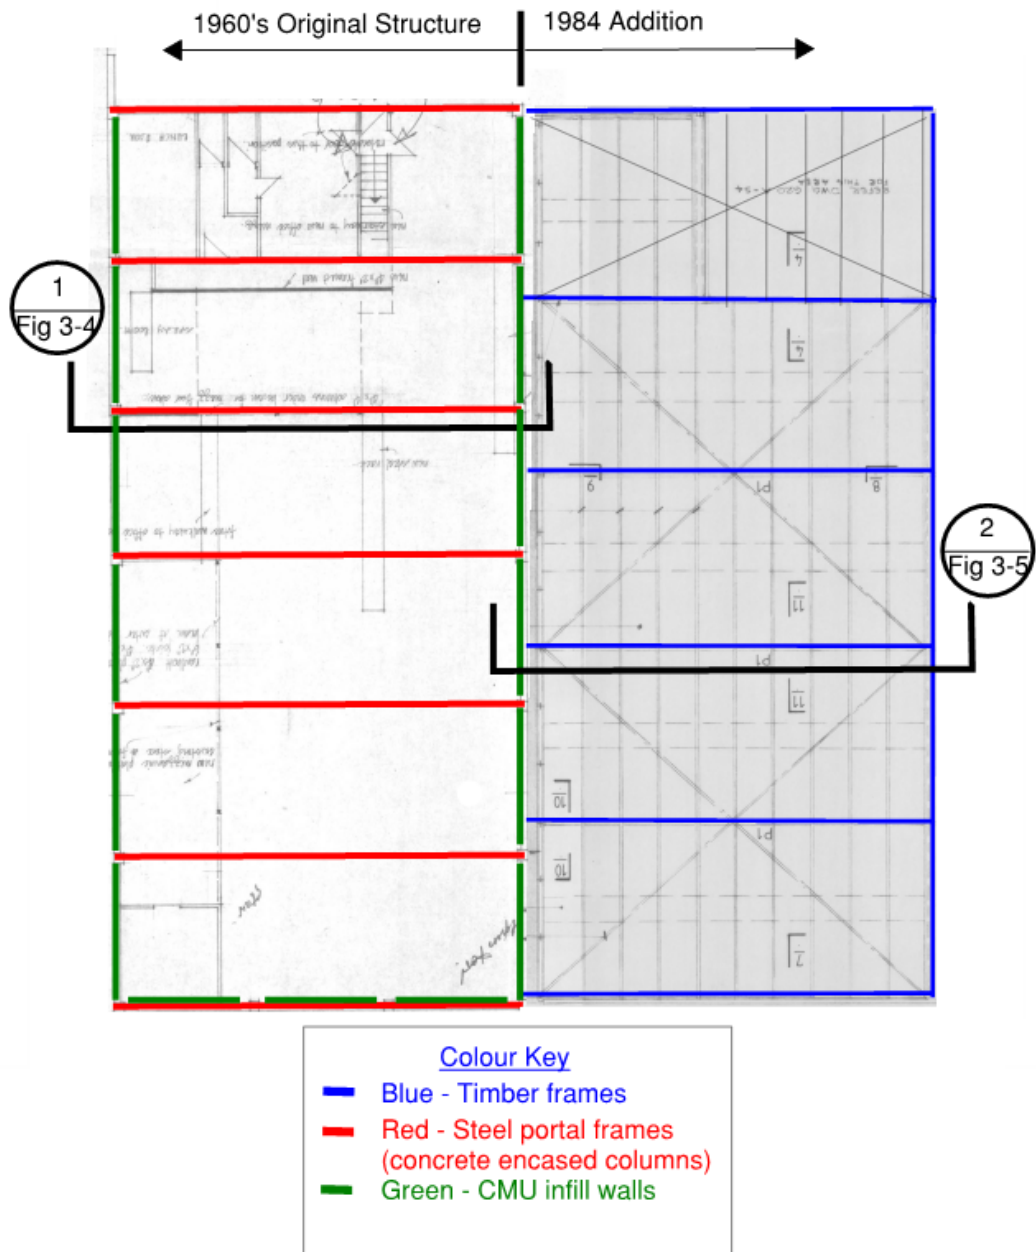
Sheer Adventure Workshop – Plan View of Building
